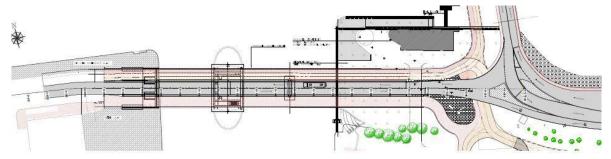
Plan of Proposed Dodder Public Transport Opening Bridge
